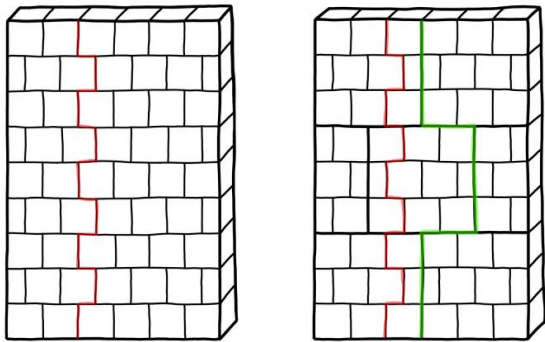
Bond(s) of masonry in traditional masonry wall and in wall of small-format precast units
